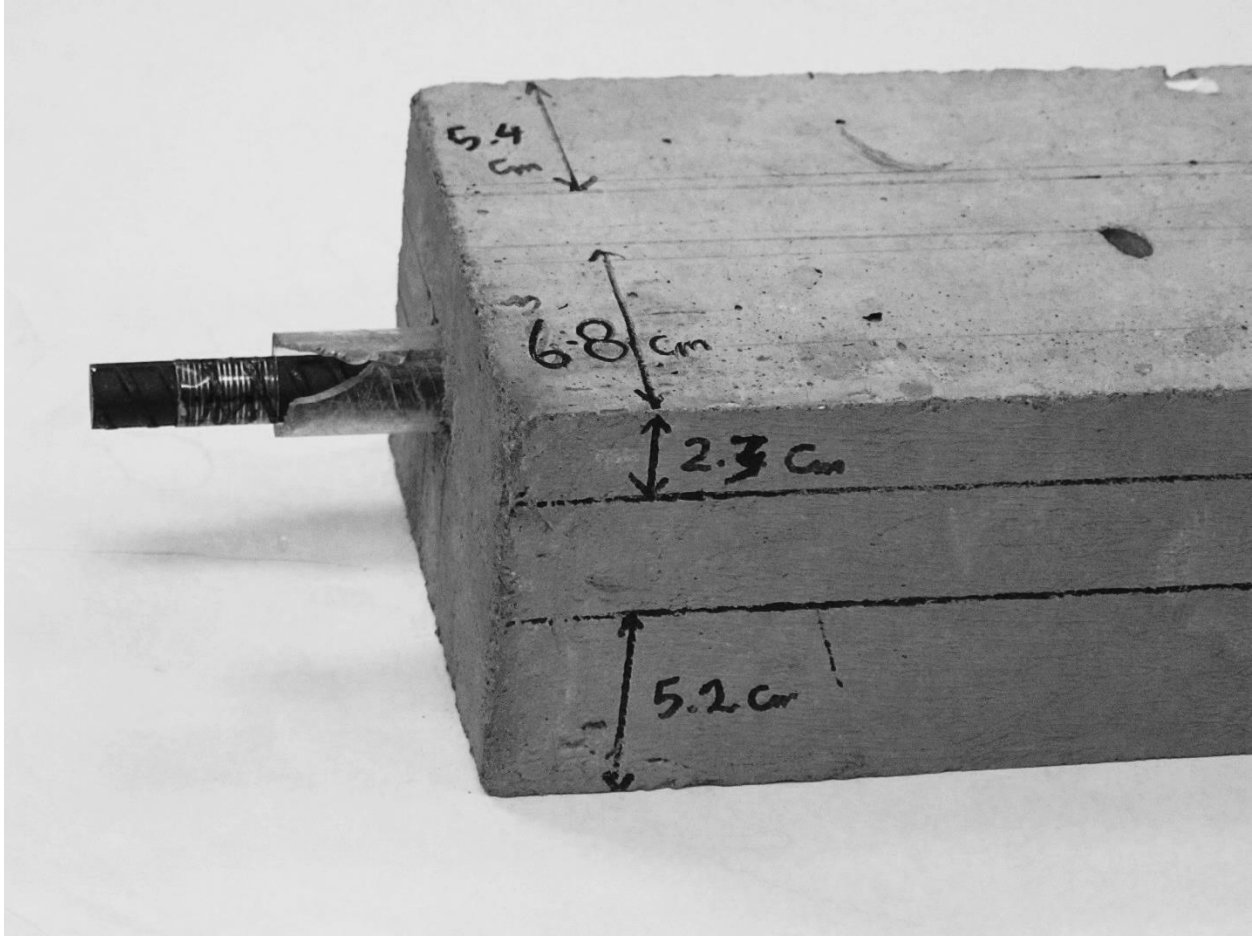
Cured concrete specimen with acrylic tube in the center and a rebar inside the tube.
